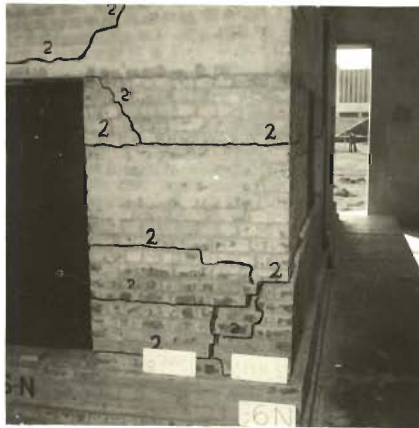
\_ BOTTOM PORTION OF NORTH - WEST CORNER SHIFTED INWARD (MODEL 6)
